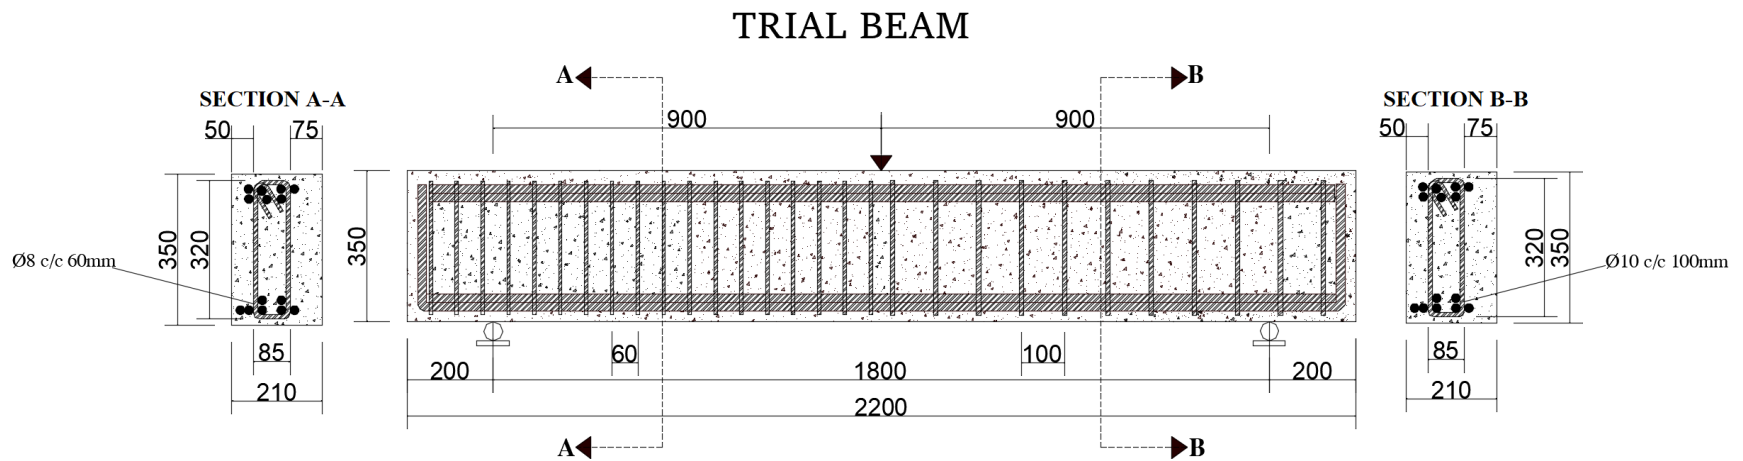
Cross Sectional Detail of Trial Beam (All Dimensions are in mm)
